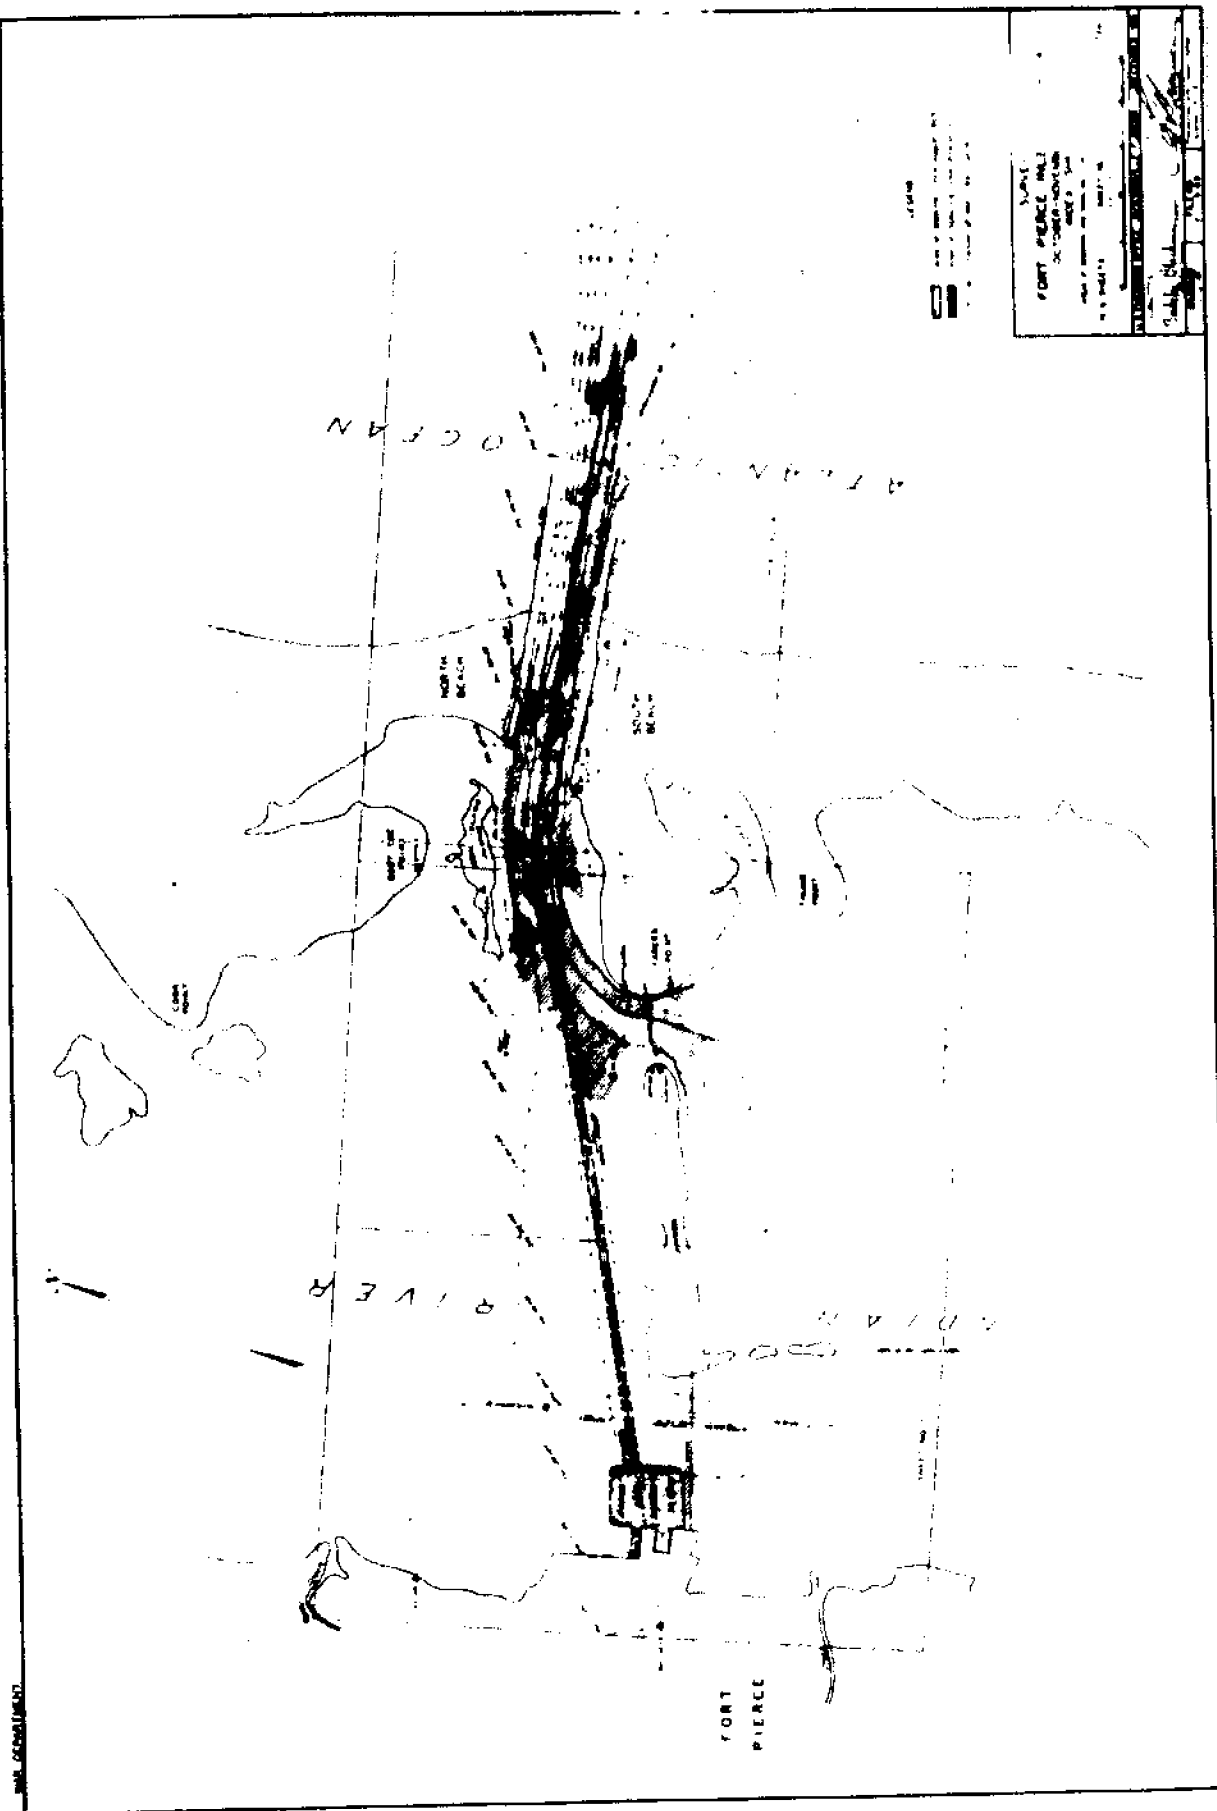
FORT PIERCE INLET, FLORIDA, FROM H.D. NO. 252, 72nd CONGRESS, 1st SESSION: SURVEY OF 1931
